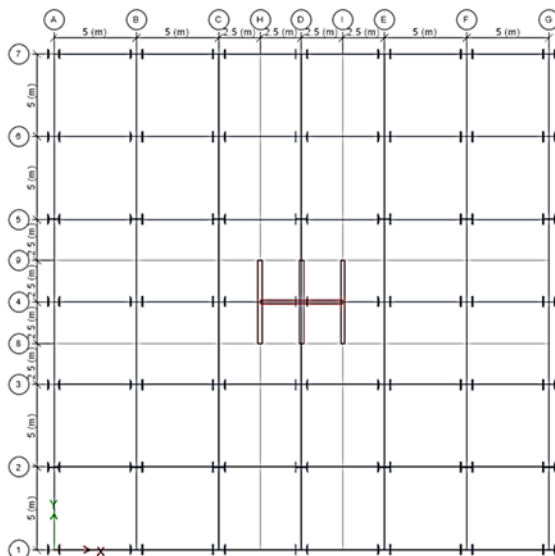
Typical plan for 10 & 20 storey symmetrical building
